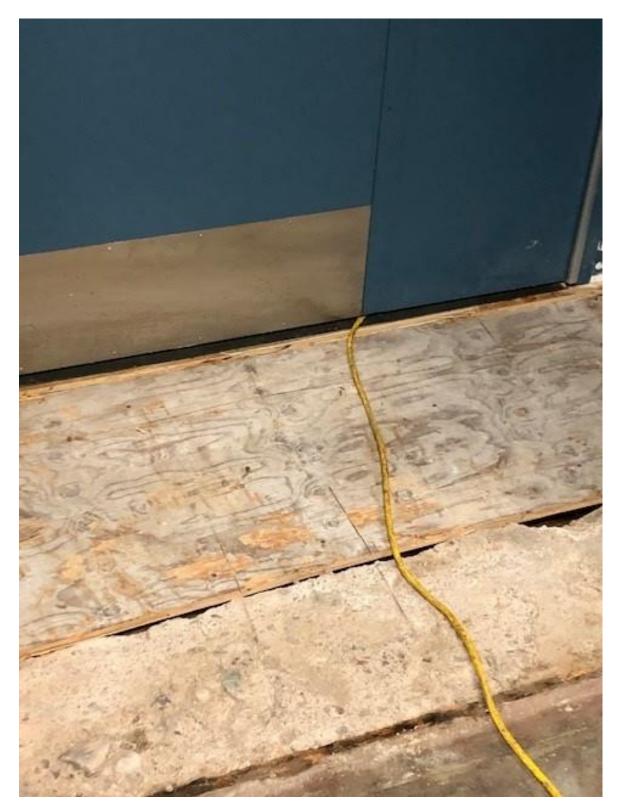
WOOD PLANKING AFTER VCT REMOVAL
